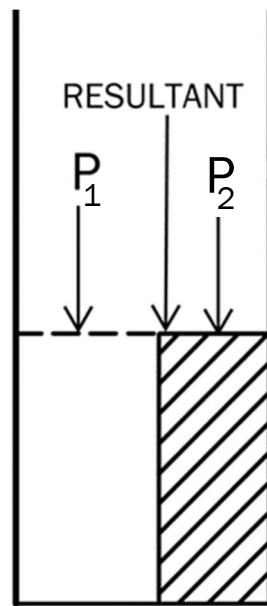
Section Moduli and Stiffness for Repaired and Remaining Sections
